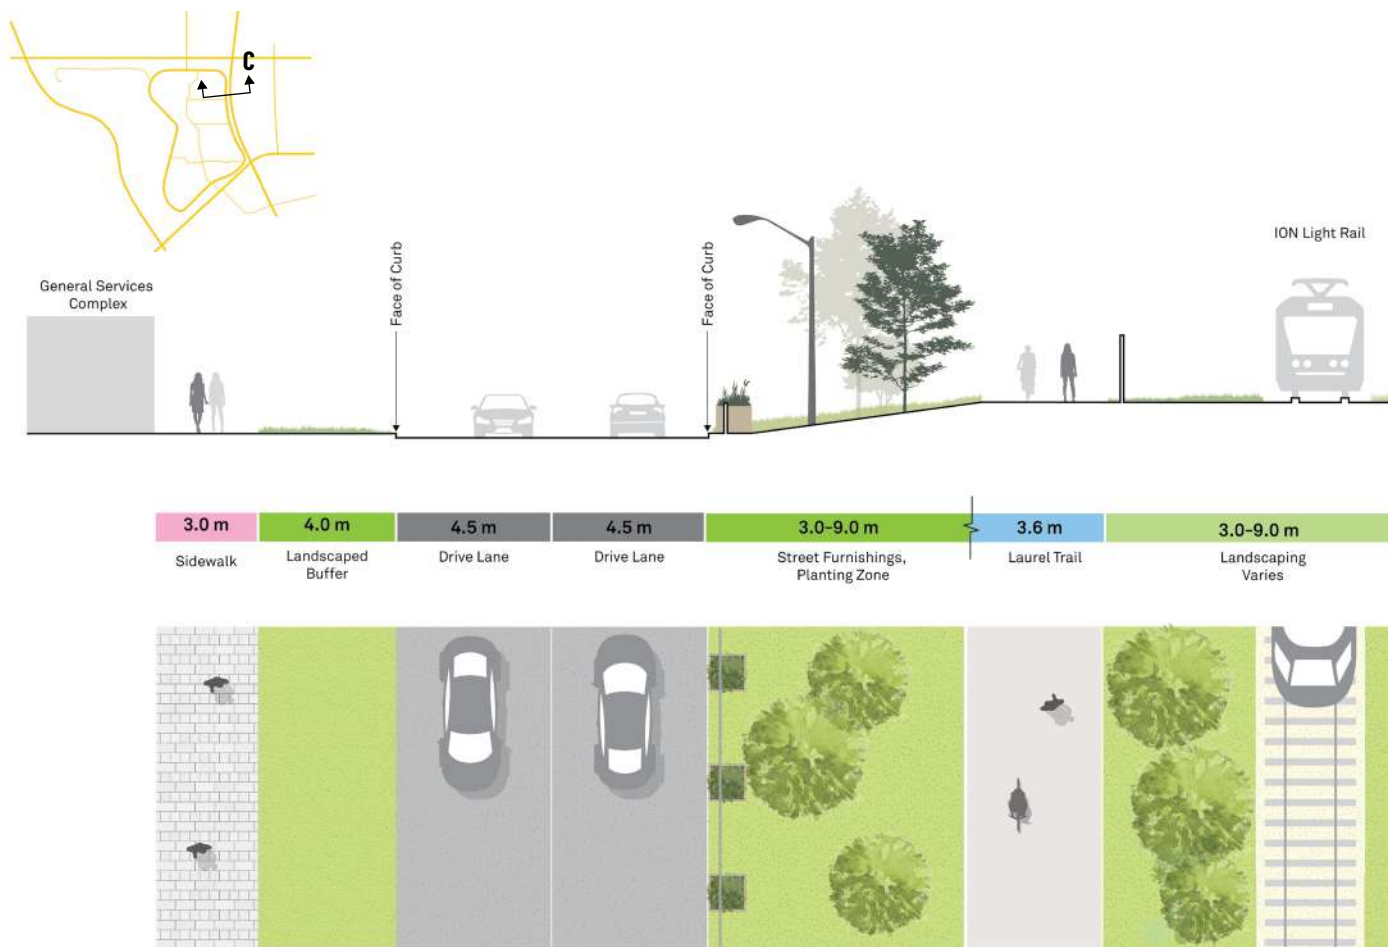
Section C. Existing condition of Ring Road (northeast edge from Hagey Blvd to William Tutte Way).
